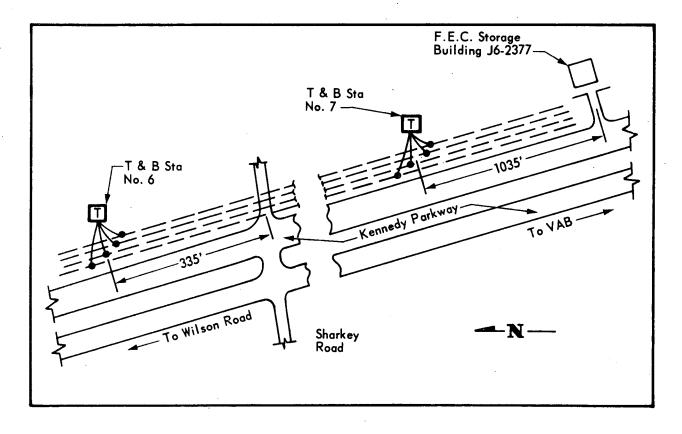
Test and Bond Stations No. 6 and 7 Equipment Locator
